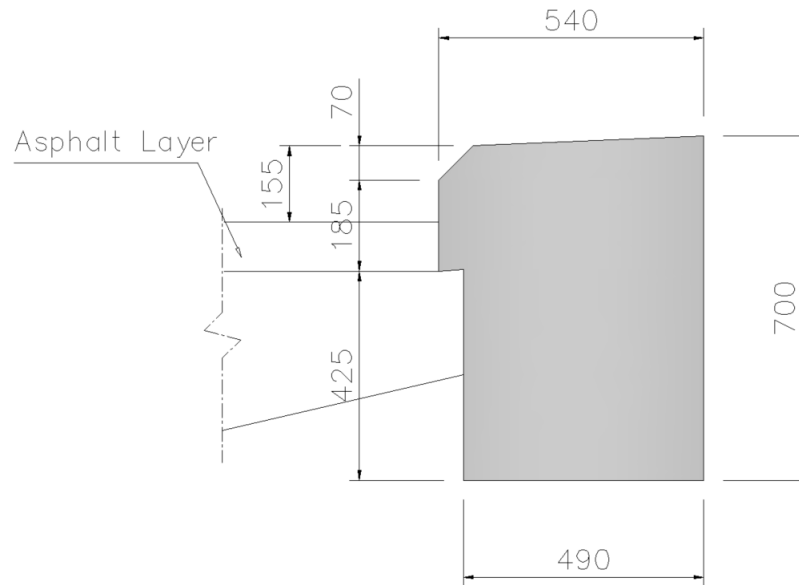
Illustration of barrier cross section (Dimensions in mm), Figure is drawn in AutoCad
